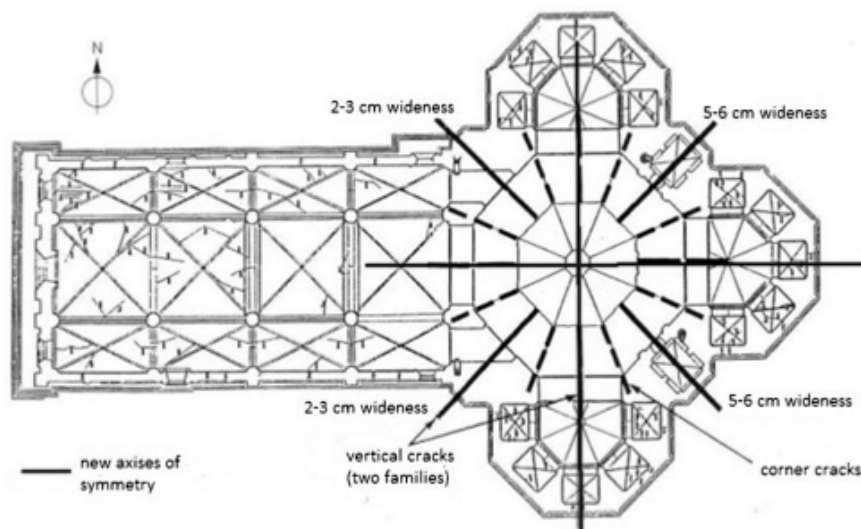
Groundfloor plan indicating three types of cracking of the dome and new axes of symmetry of the building structure (authors' version based on Fanelli, 2004 [6]).
